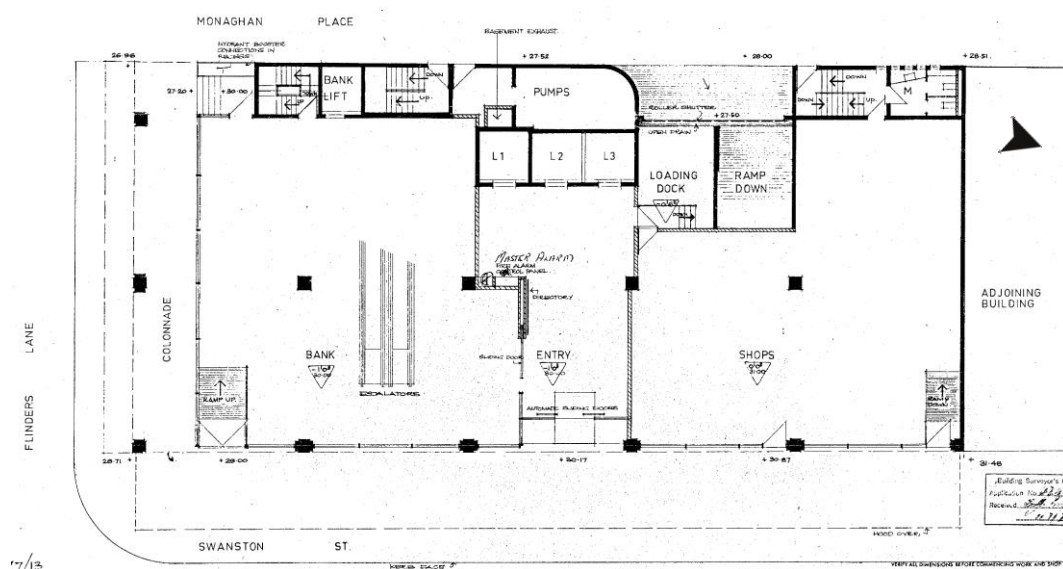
Ground floor plan. Drawing by Buchan, Laird & Buchan, dated April 1971 (BAP).
